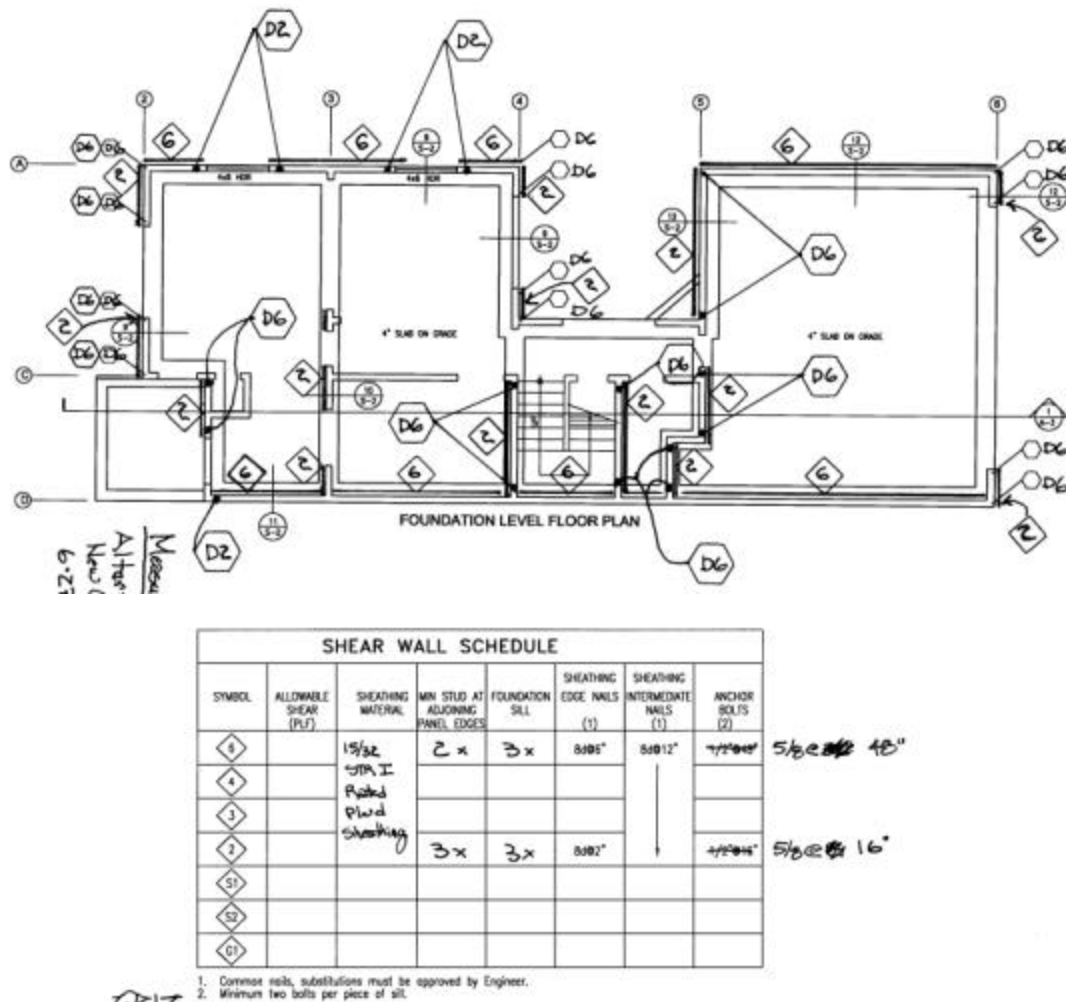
Modifications to First Floor OSB Shear Walls for Retrofit Measure No.5 of Townhouse Index Building (Cobeen, 2001).
